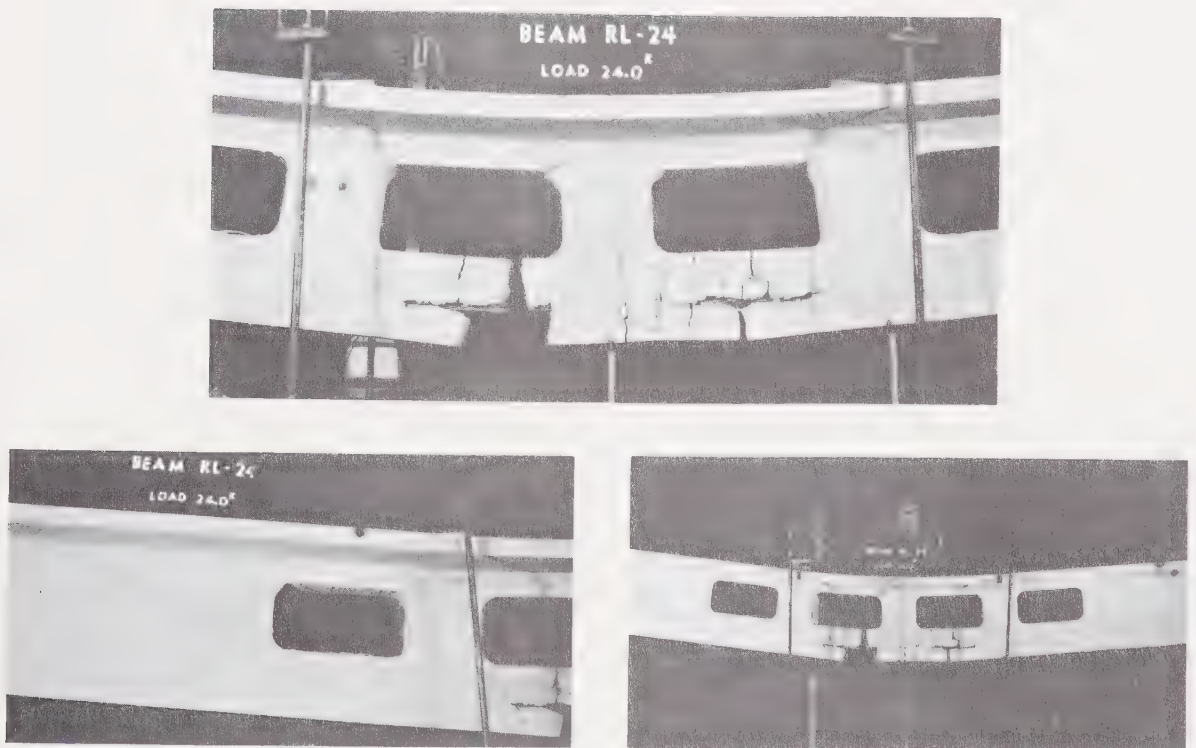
CRACKING AND FAILURE PATTERN OF BEAM 24-16-6
